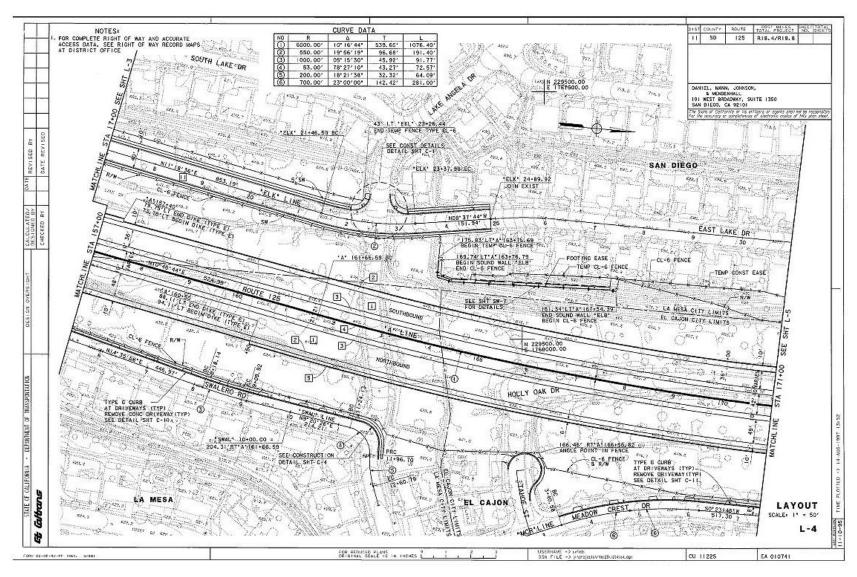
Highway plan view (Banks, Fig. 3.3, p. 58)
